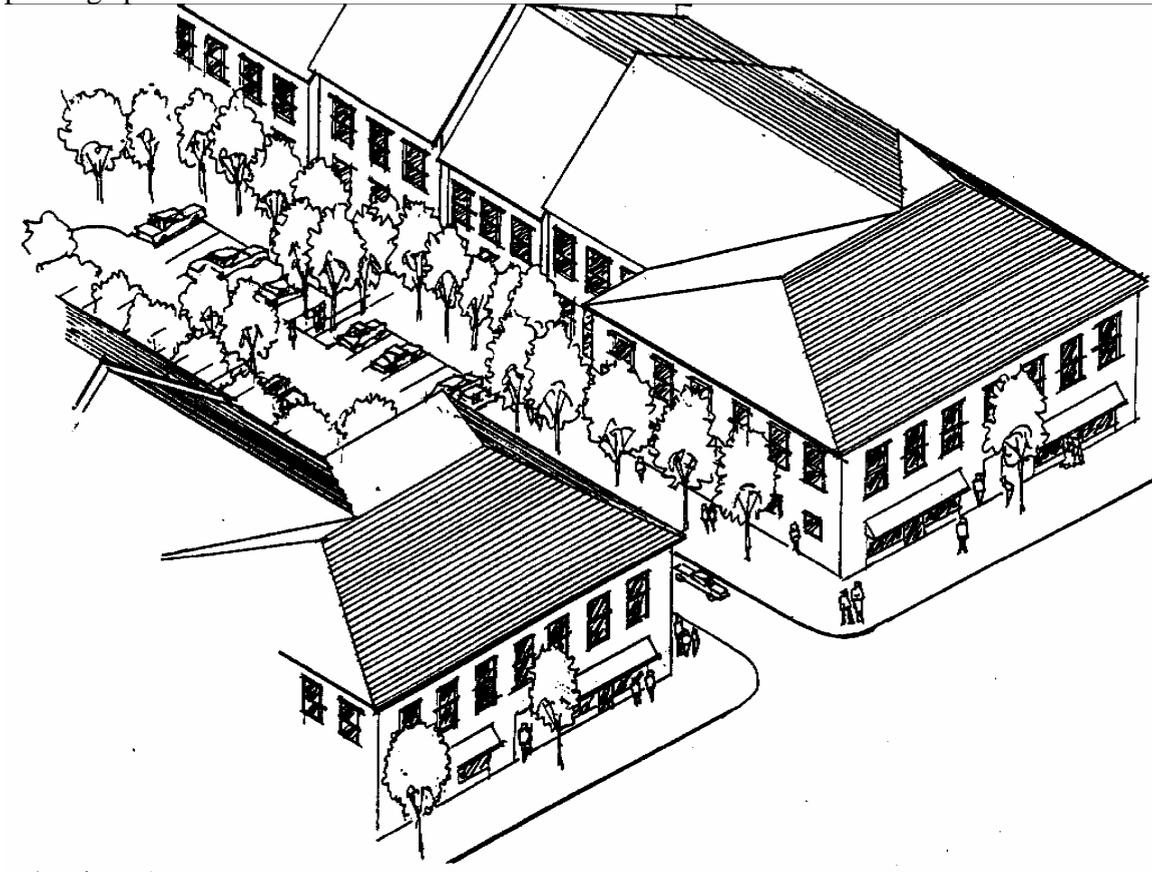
Aerial perspective sketch of a mixed-use area integrating commercial (ground floor) and residential (second story) uses. A relatively narrow gap in the continuous street wall (created by the mixed - use buildings) provides access from the street to a landscaped, pedestrian-friendly parking lot.
